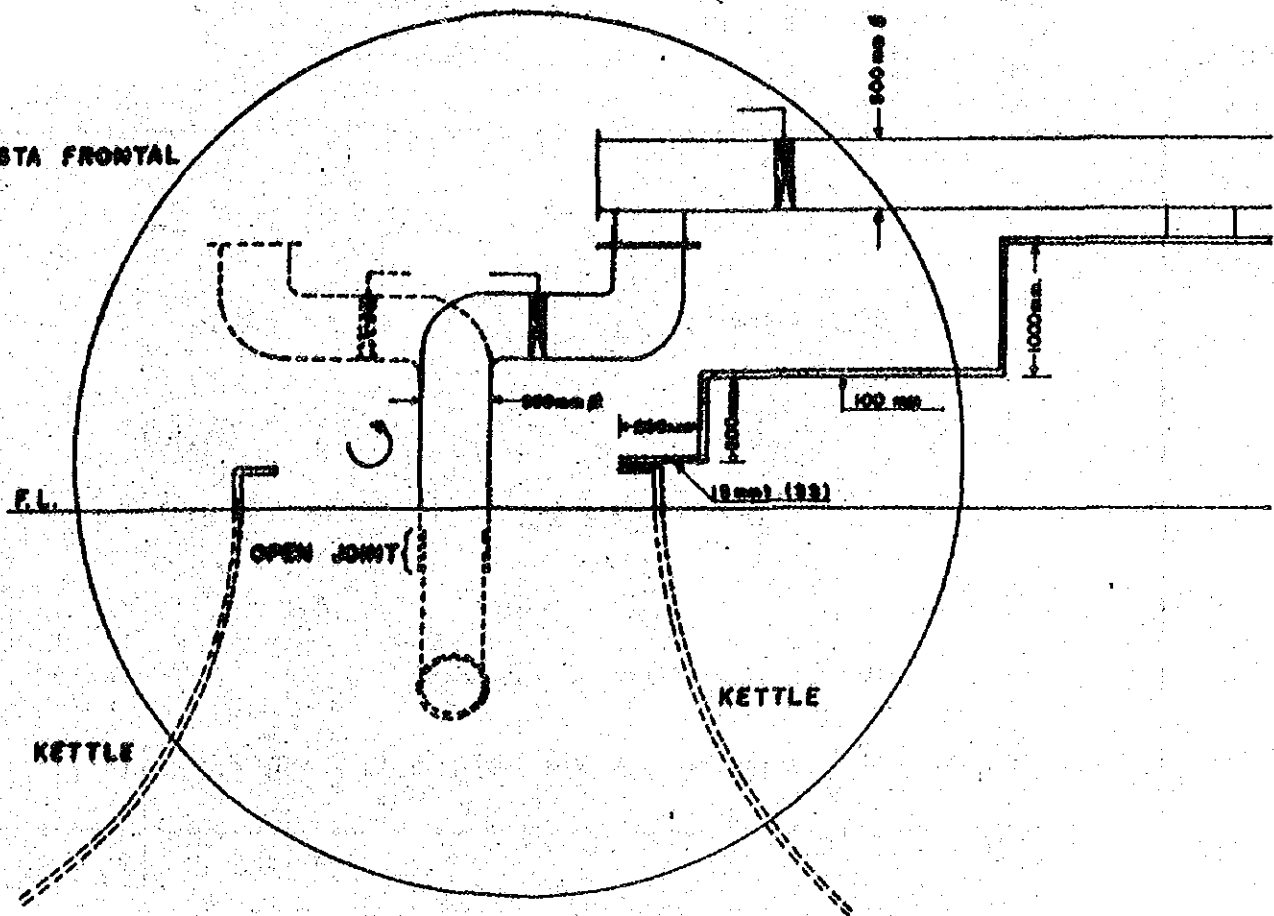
DETAILS OF CONNECTING PART OF GAS DRAWING PIPE
